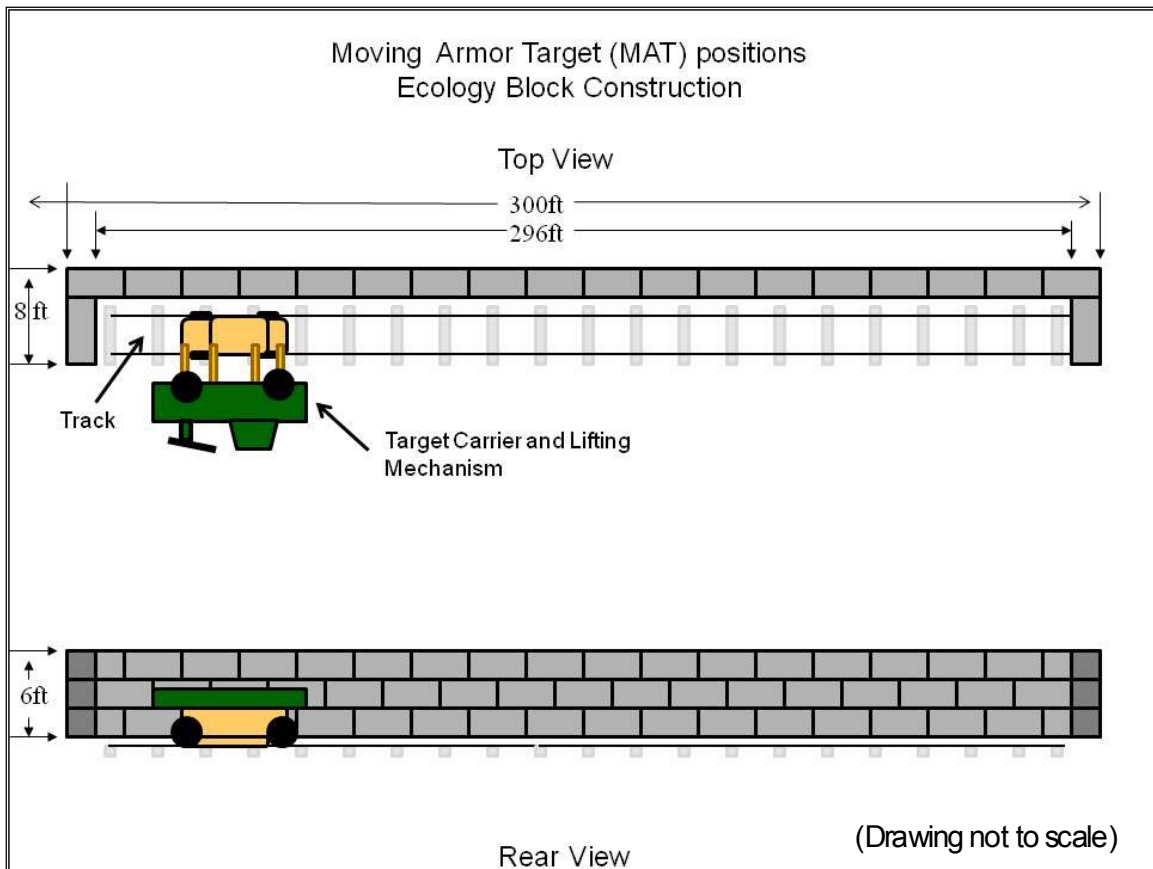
Representative MAT Emplacement Elevation Drawing
